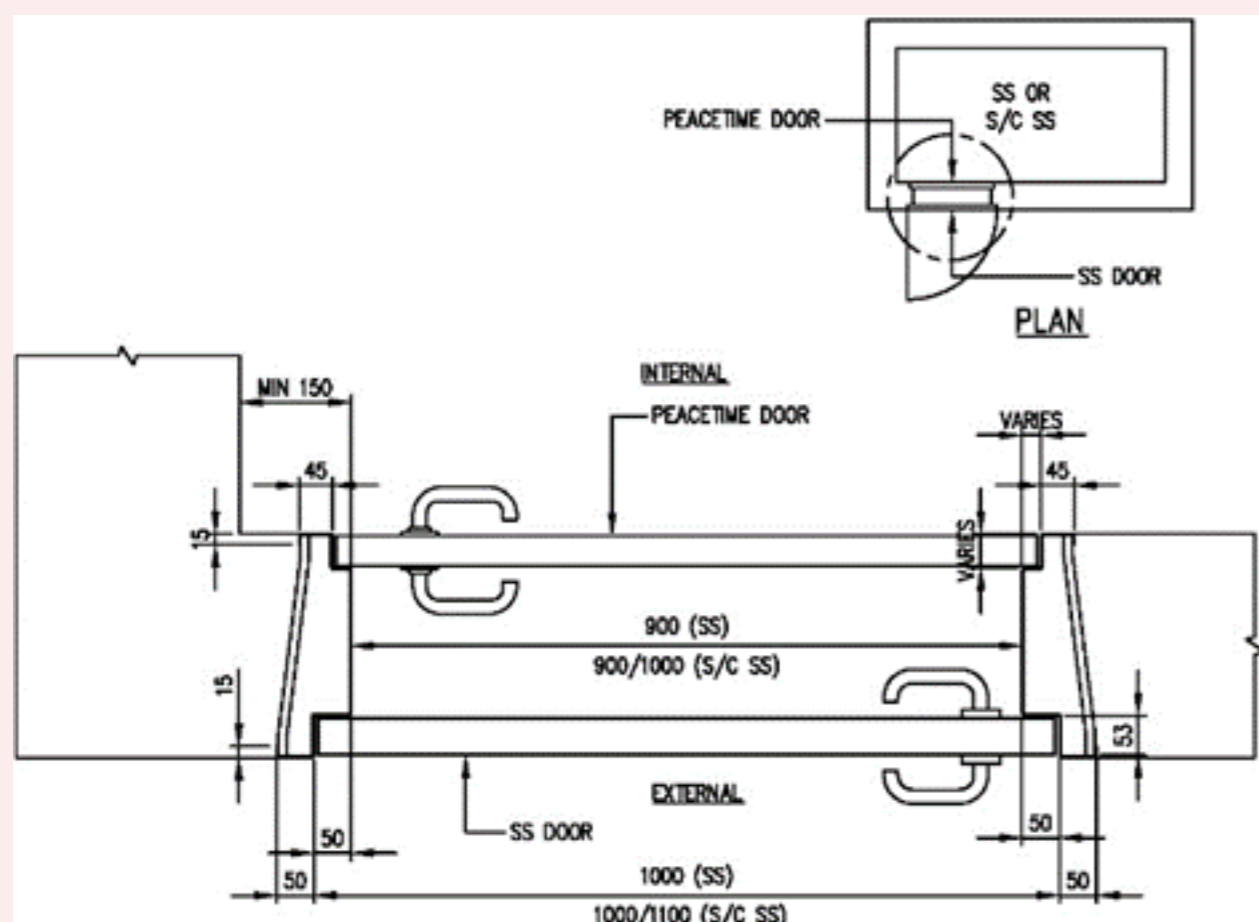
(b): SS DOOR FRAME WITH DOUBLE DOOR REBATES
